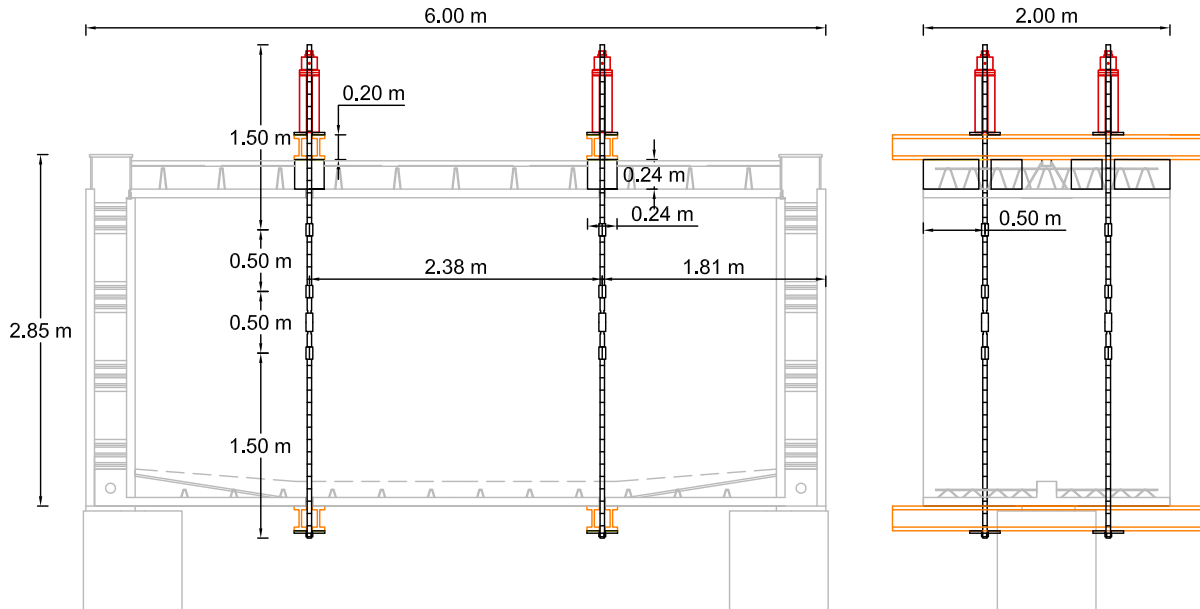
Test setup for the structural stability tests in front view and section A-A
